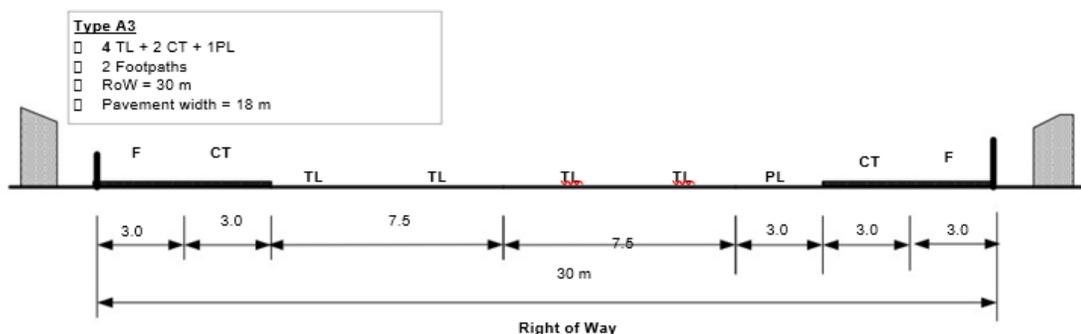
Typical cross section of Sub Arterial (Feeder Roads)
